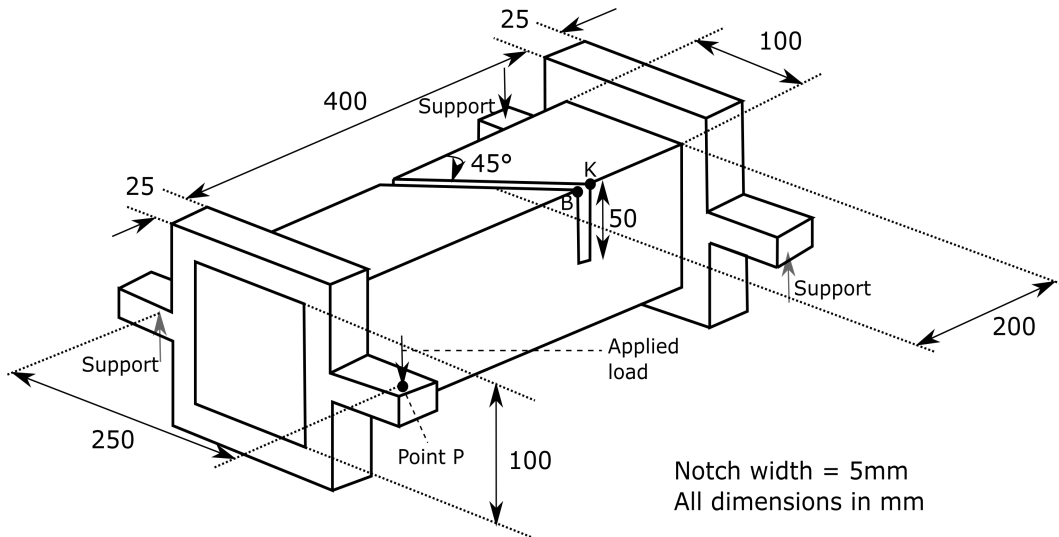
Test setup and dimensions for prismatic skew notched concrete beam
